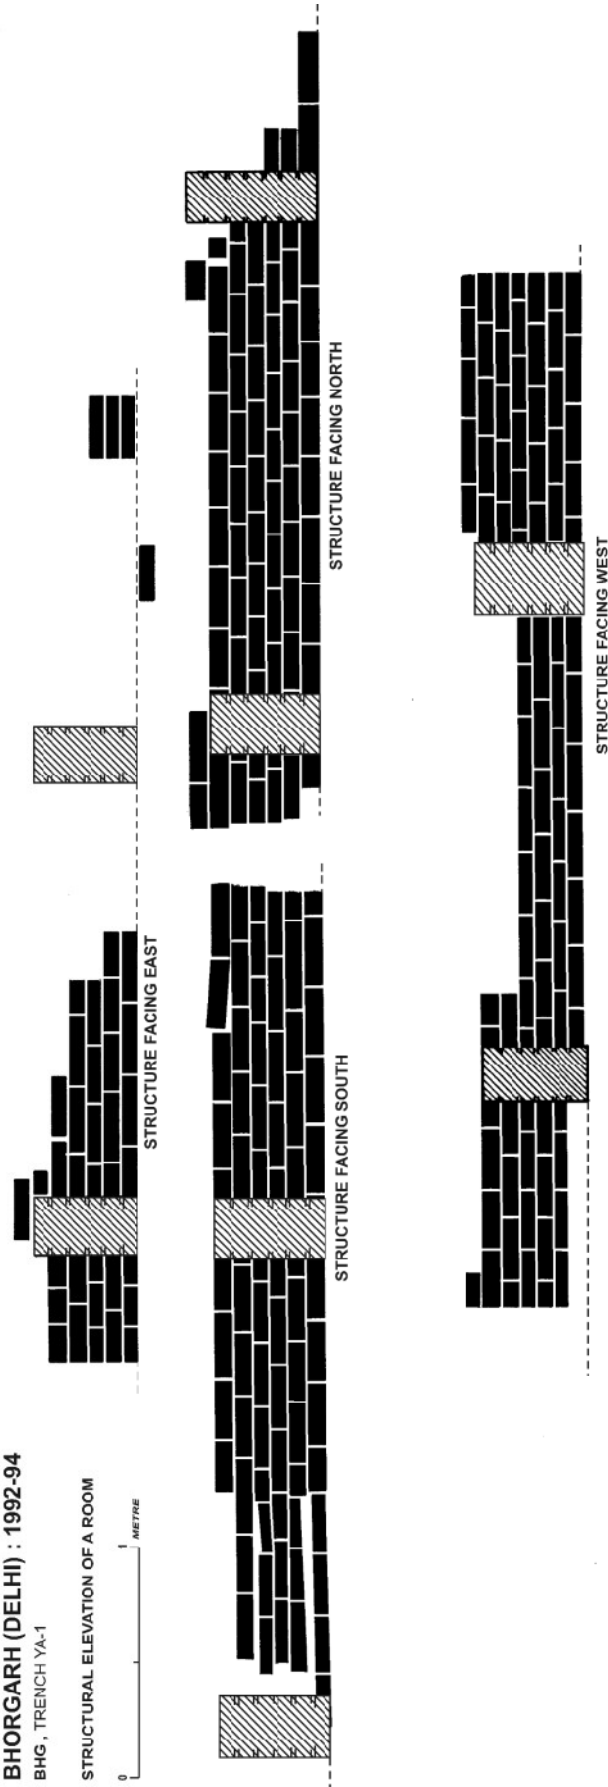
STRUCTURAL ELEVATION OF A ROOM OF KUSHAN
